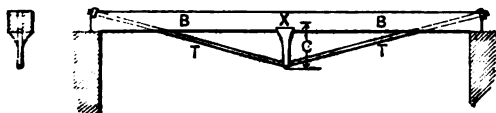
Trussed Wooden Girder. One Vertical Strut
